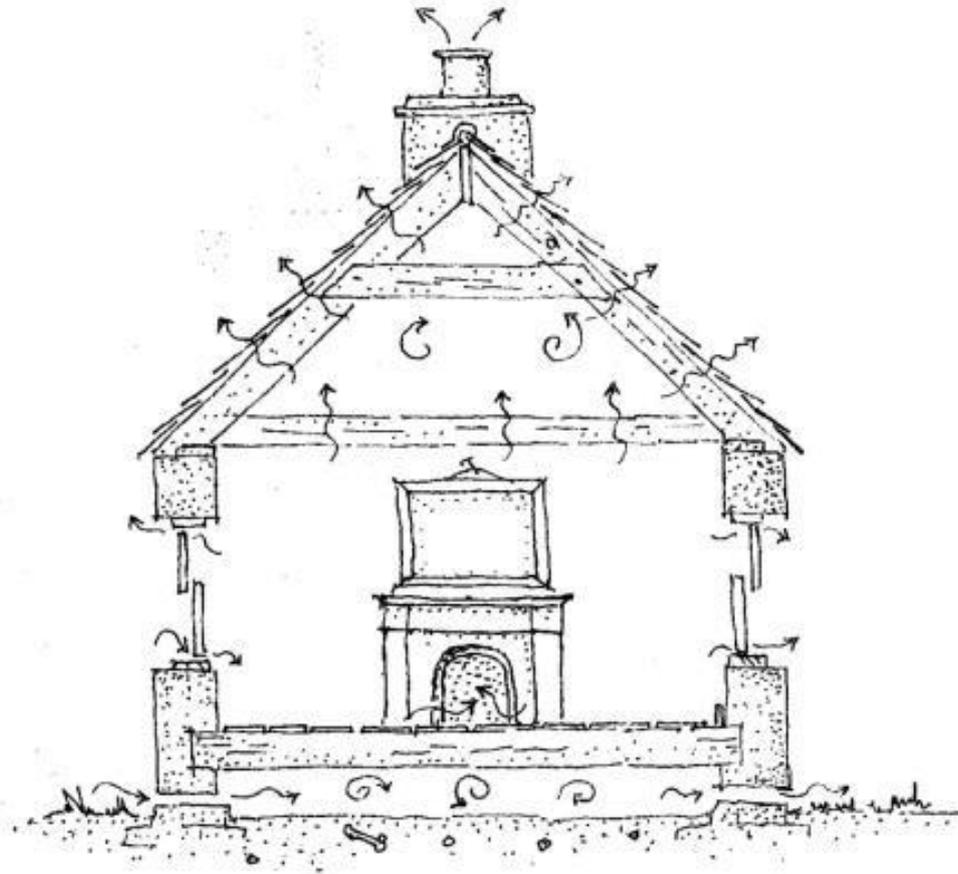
Sketch section illustrating how air moves into, out of and within a building.
